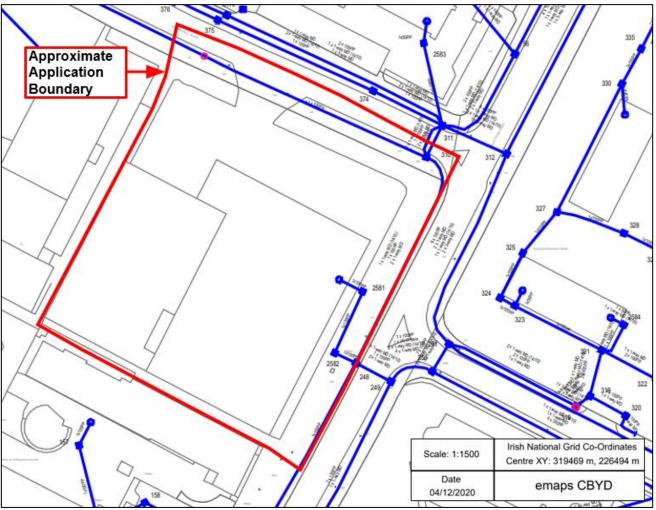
Eir Service Layout surrounding the Carmanhall Road SHD.
